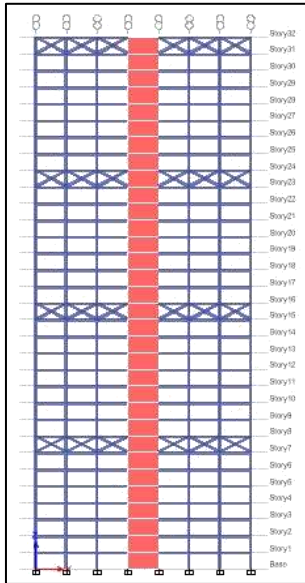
Sectional Elevation of Building Model 2 (With X Outriggers)
